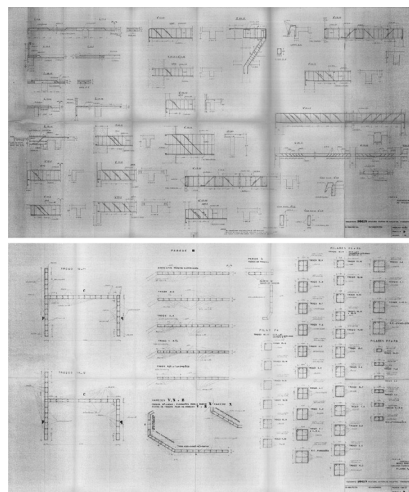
Hotel D. Henrique: reinforced concrete elements (CMPorto & Loureiro, 1966).
